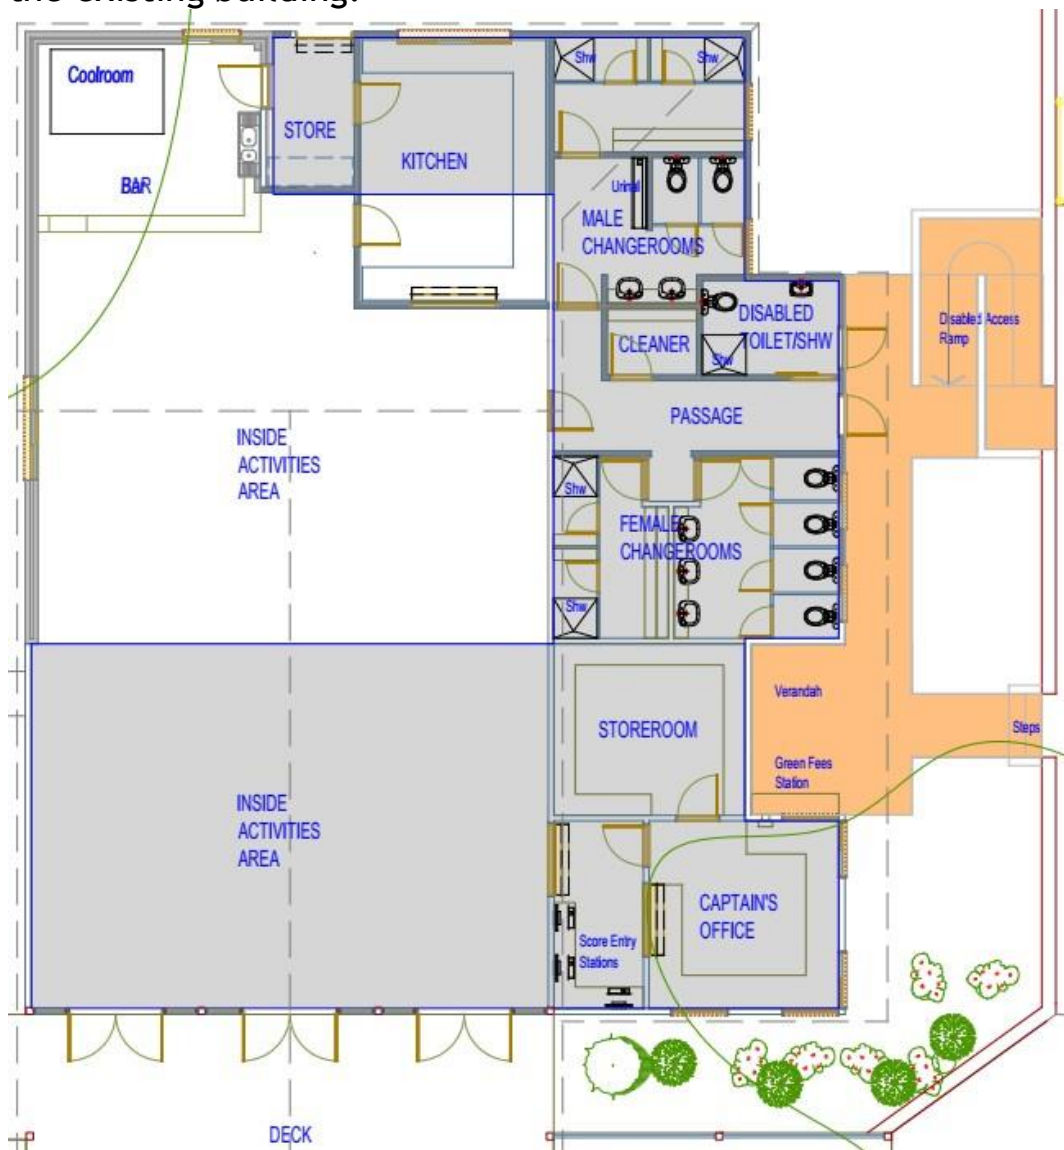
Proposed Clubhouse Upgrade Floor Plan
